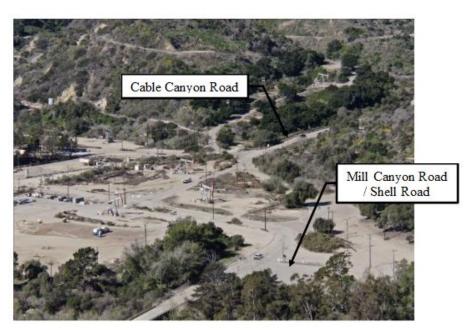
West-facing view of the north side of the existing Devil's Canyon Road Site, Mill Canyon Road/Shell Road, and Cable Canyon Road
